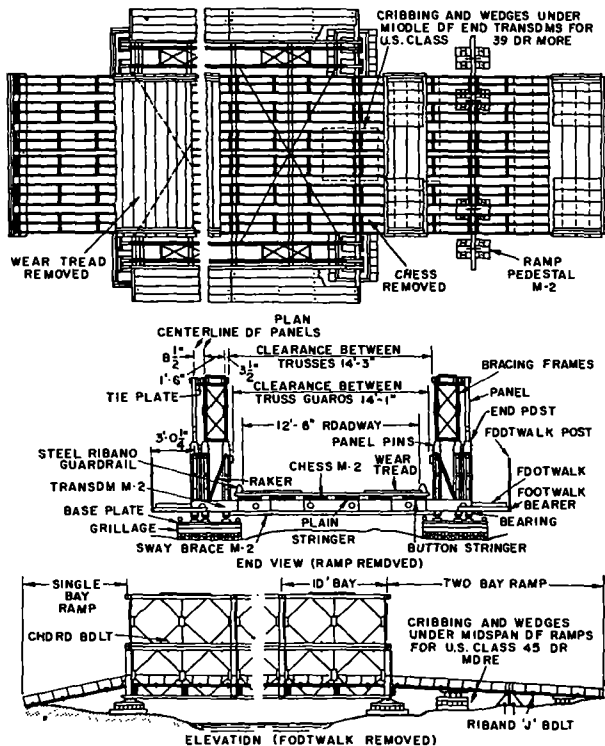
Steel panel fixed bridge, Bailey type, M2.
